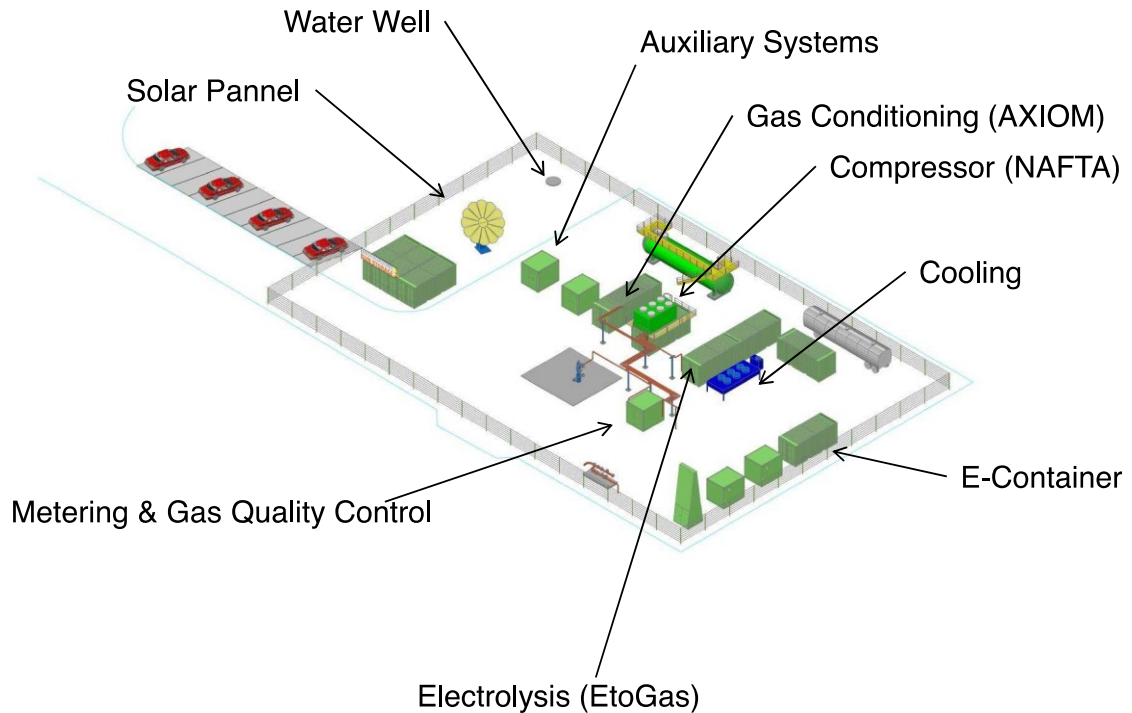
Planned surface facilities for the project Underground Sun Storage⁴¹
